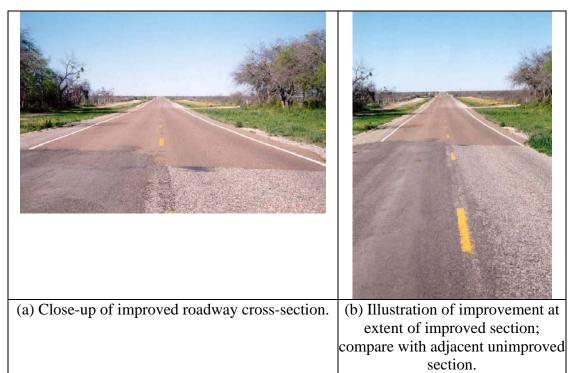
Improved	Roadway S	Section	at Site 98-02.
